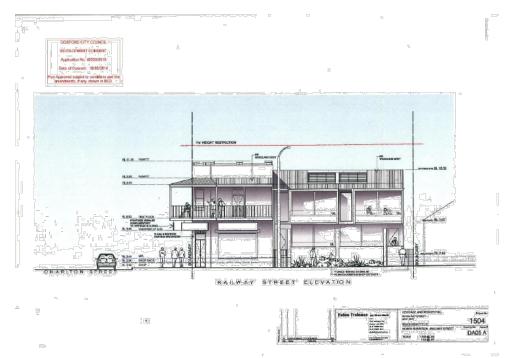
Approved Railway Street Elevation - DA48230/2015
